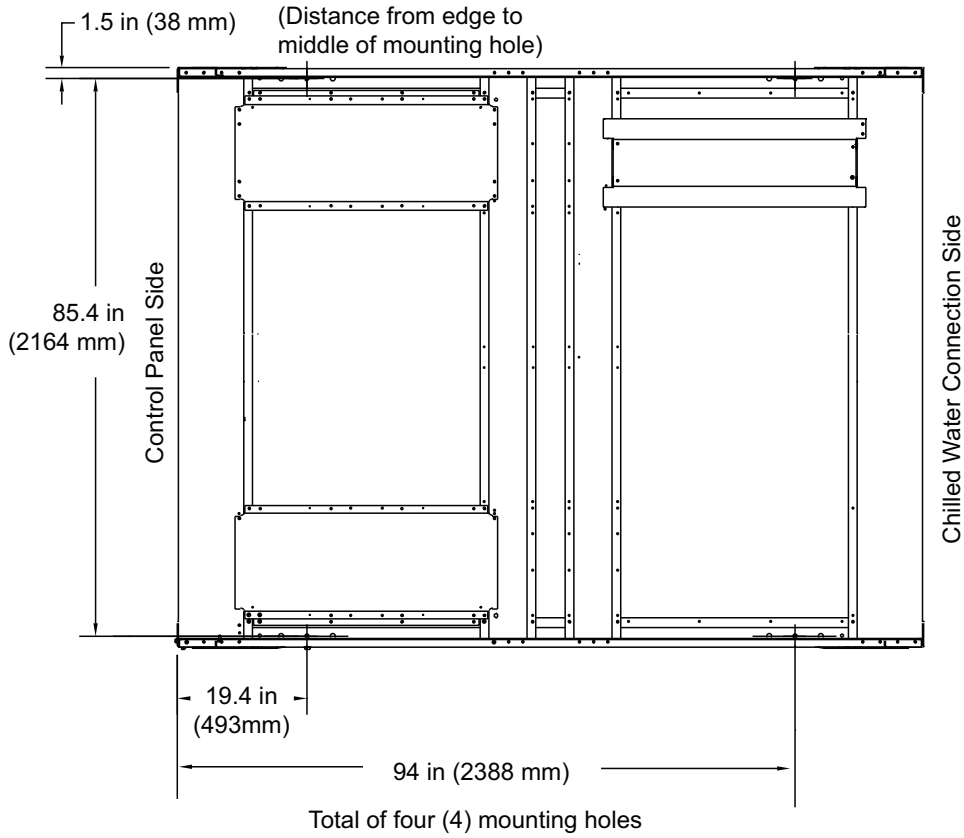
Mounting locations, 60 and 70 ton units without wind load option
